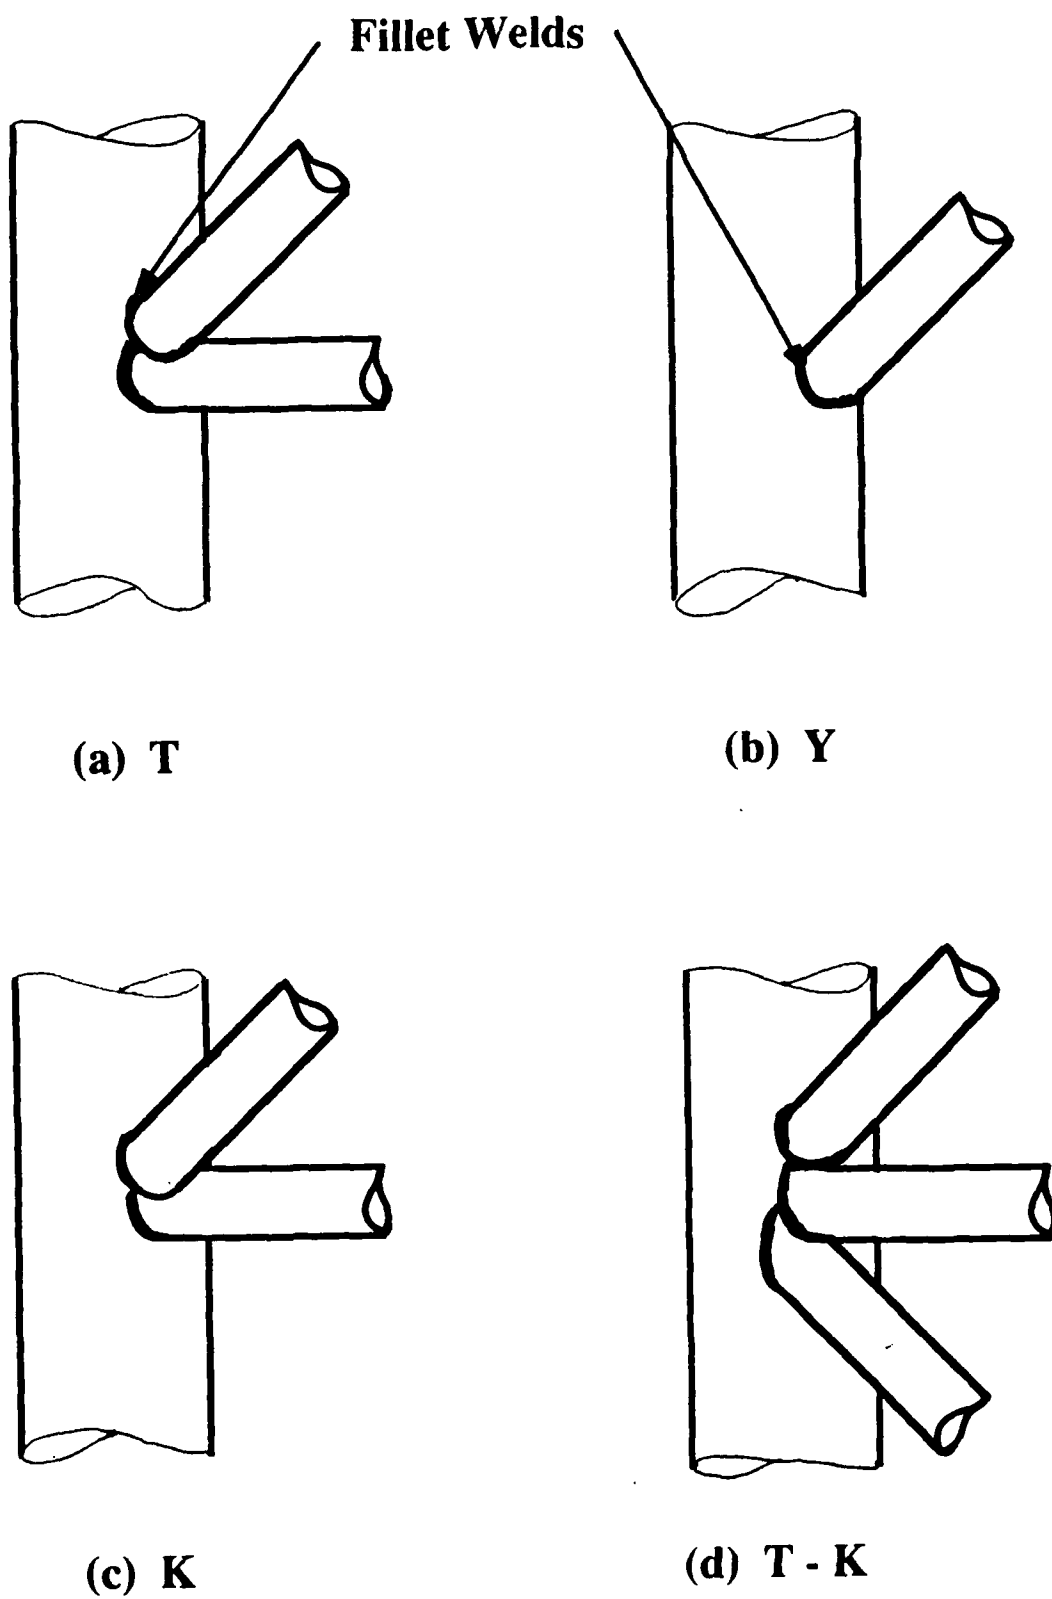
Types of Weld Joints Used in Tubular Construction
